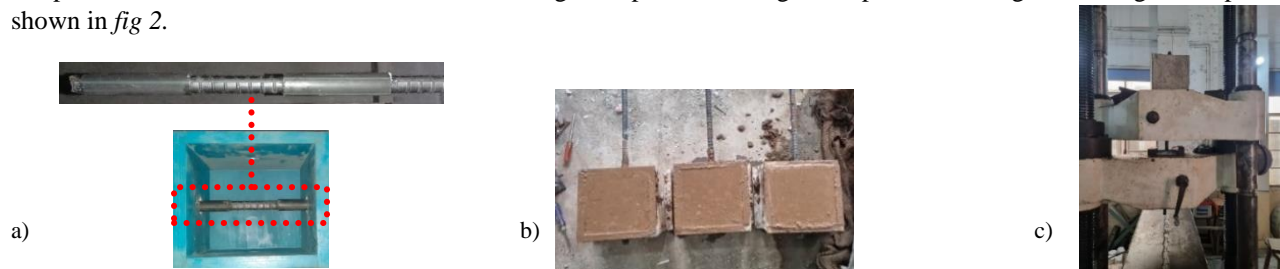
a. Bar Placement b. Cast Specimens c. Pull-out Test Arrangement
